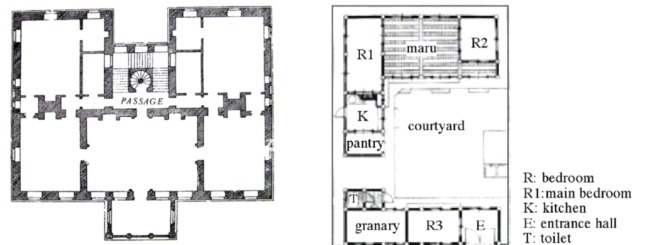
Room-to-room enfilade: Amesbury house(1661, left) by John Webb and Floor plan of urban traditional Han-ok (right).
